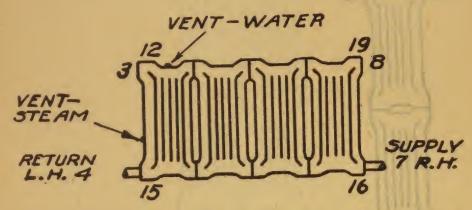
Assembled in single tier. For water, one or two pipe steam.
